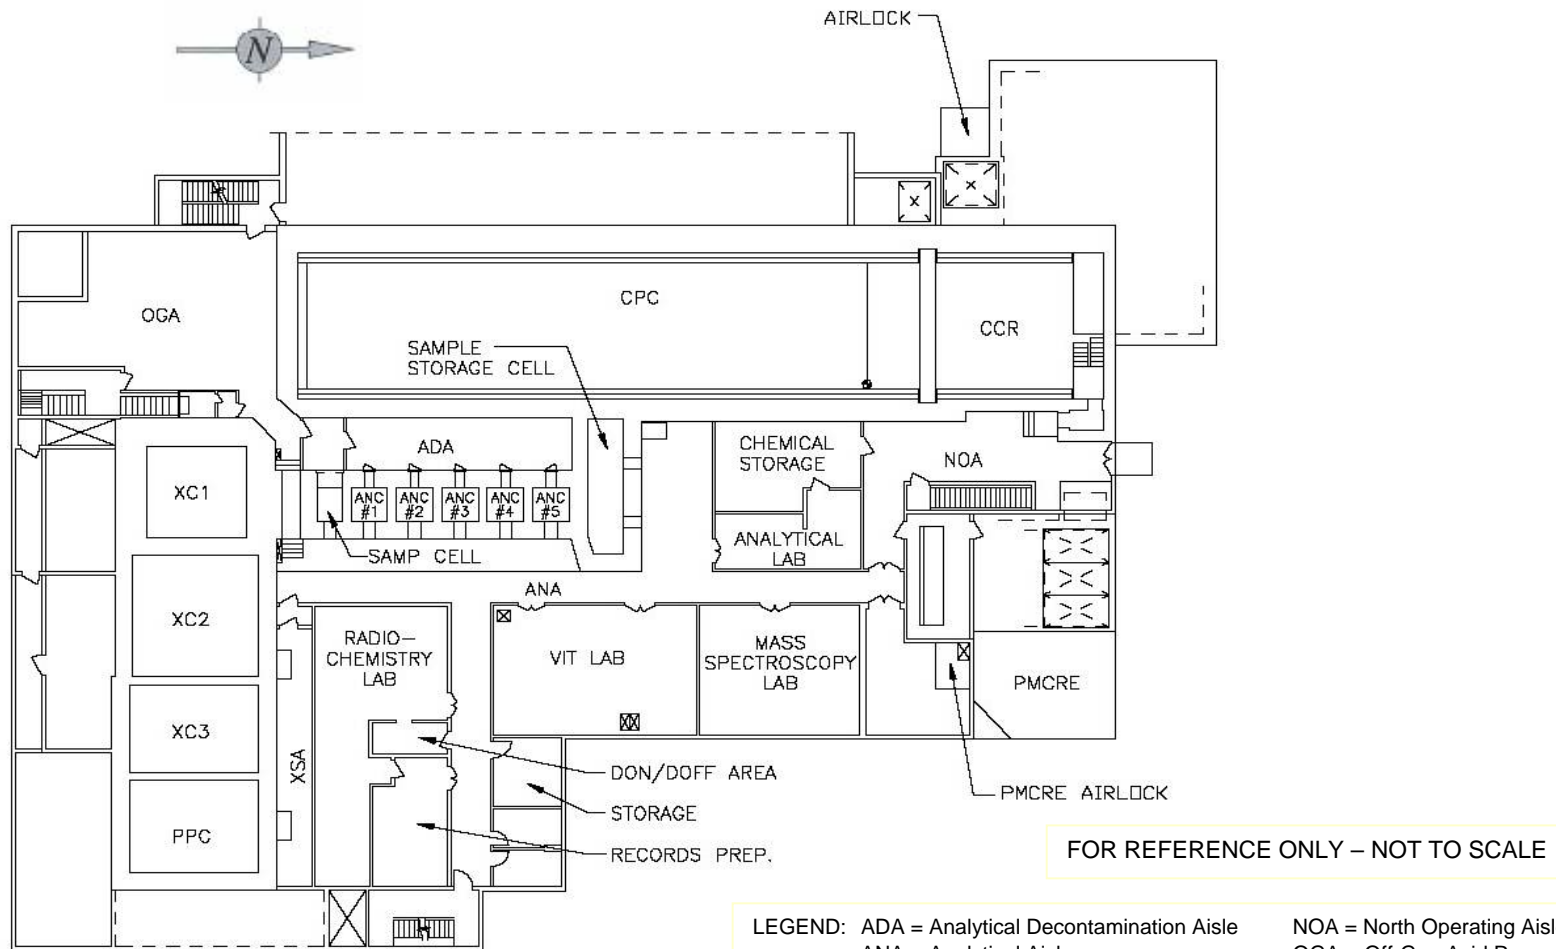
D. Process Building Layout at 131-Foot Elevation
